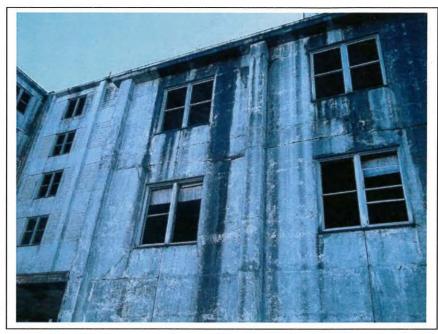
Many exterior cracks appeared to form at individual floor levels; looking southeast. (October 22, 2014)
